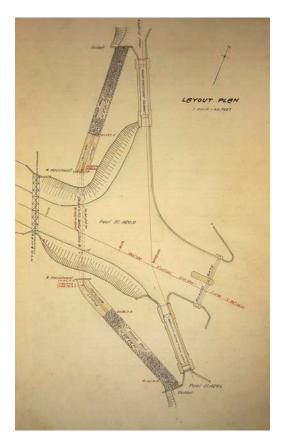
Map showing alignment of dive culvert, 1918 (New York State Canal Corporation).
